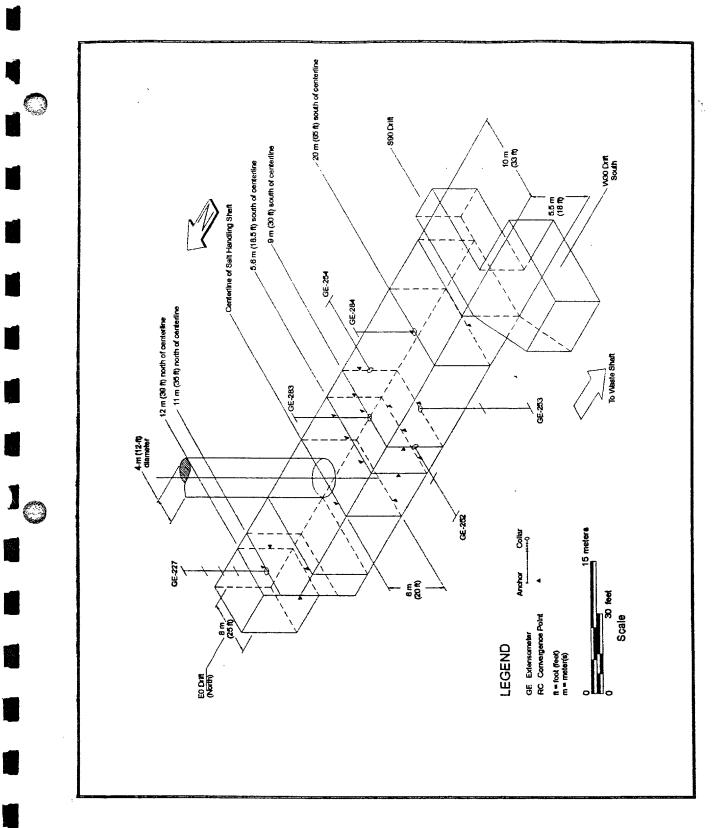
Salt Handling Shaft Station Instrumentation Before Roof Beam Excavation
